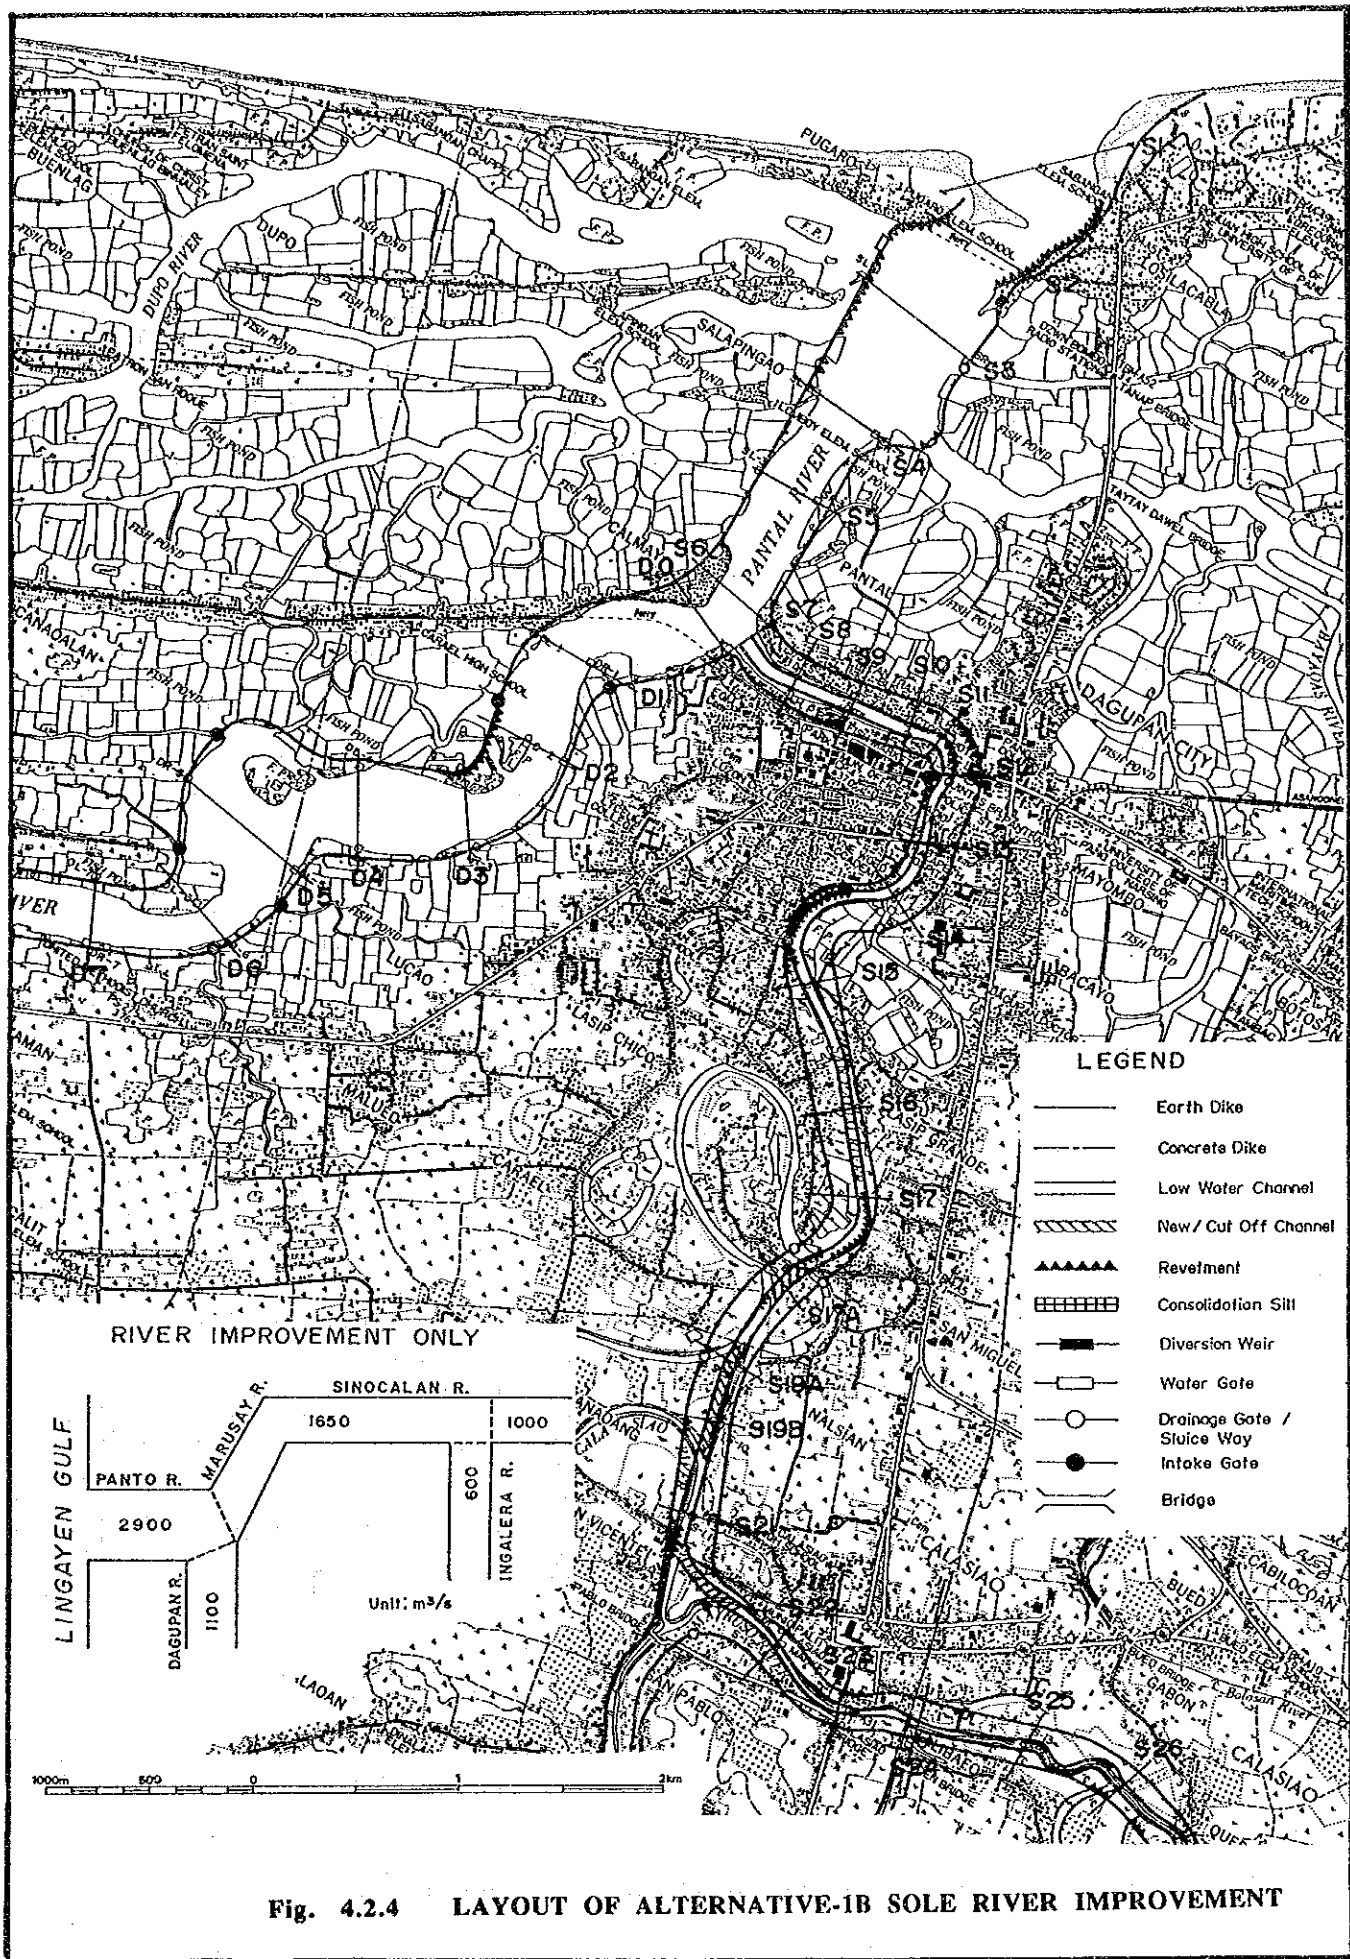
LAYOUT OF ALTERNATIVE-1B SOLE RIVER IMPROVEMENT
